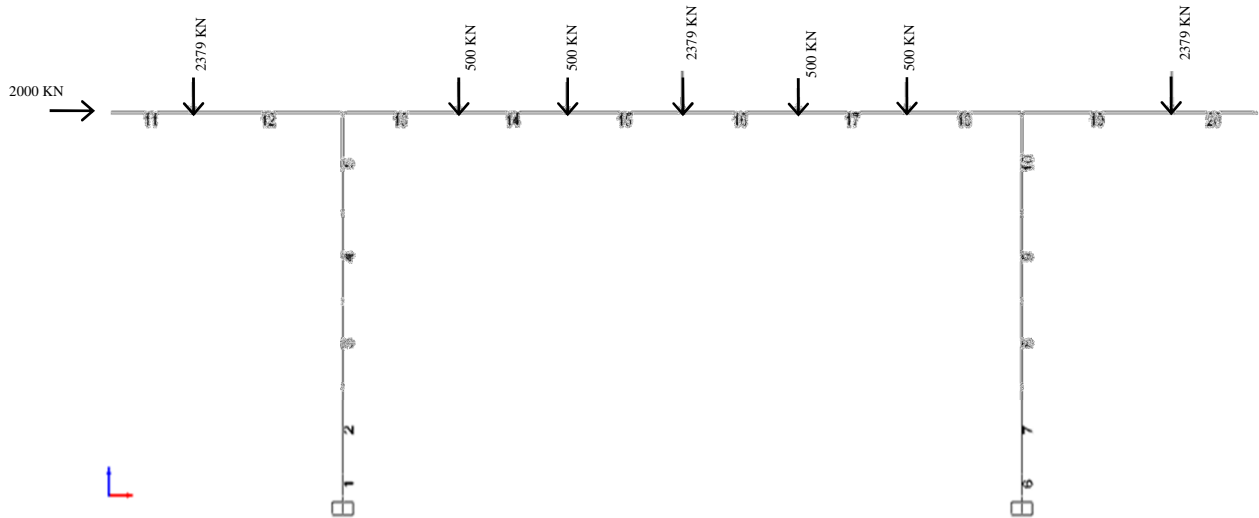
Finite element model for Pier 2 of Portage Creek Bridge
